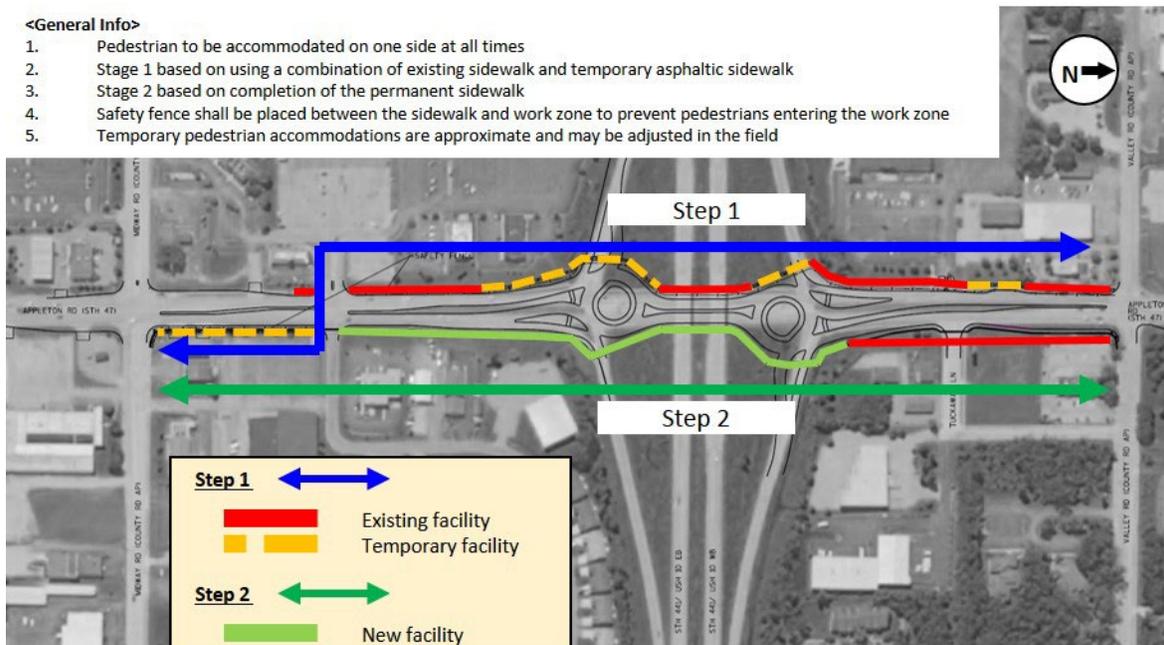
Pedestrian staging plan for Appleton Road interchange. Source: UW-TOPS Lab
